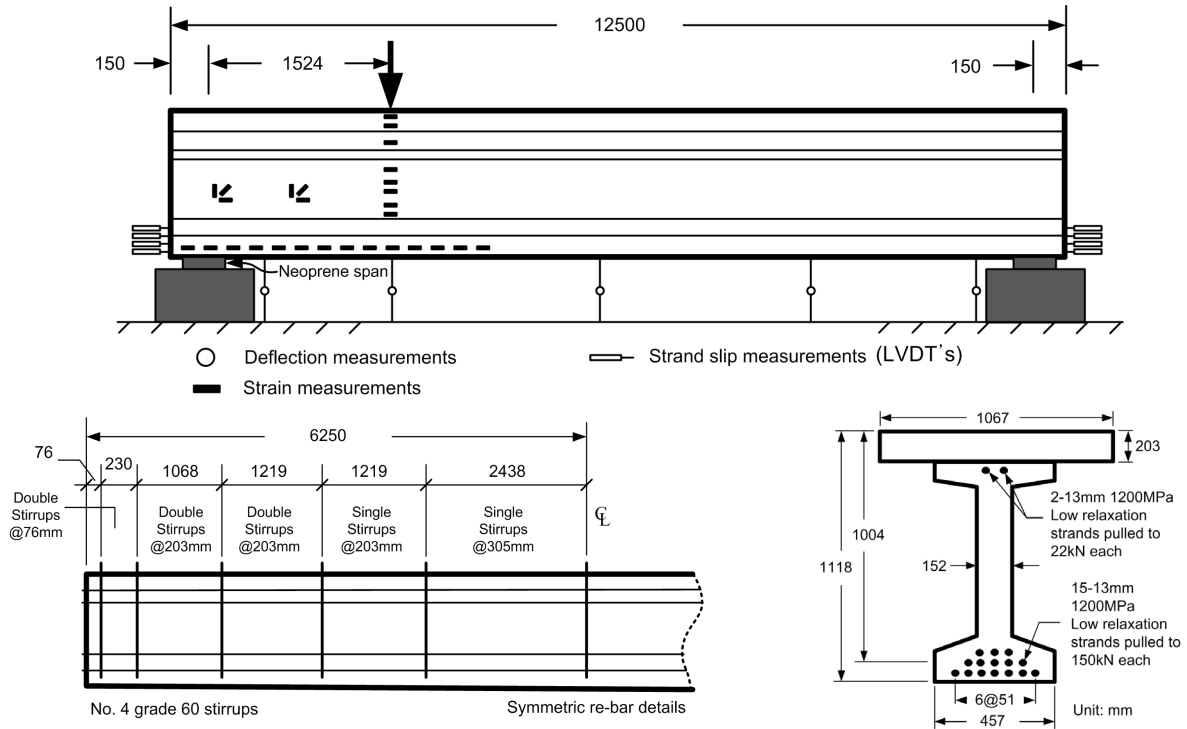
Test Setup and Reinforcement Details of Beam B1-00-2RN (Shahawy & Batchelor, 1996)
